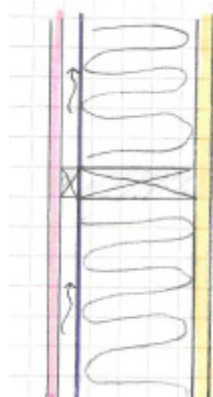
Exterior wall with a thin wind barrier membrane and ventilated cladding
